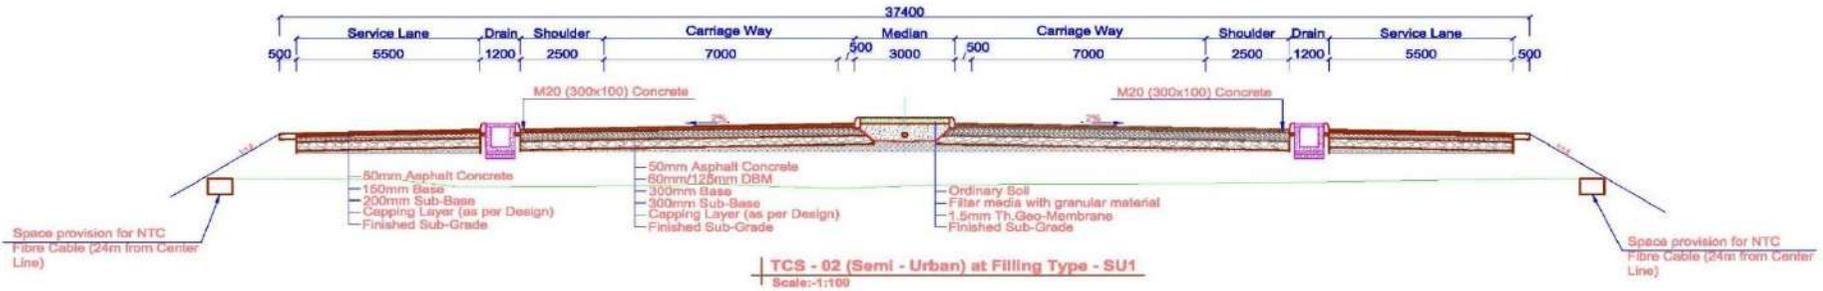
Typical design of road section in semi-urban area (Intermediate Lane)
